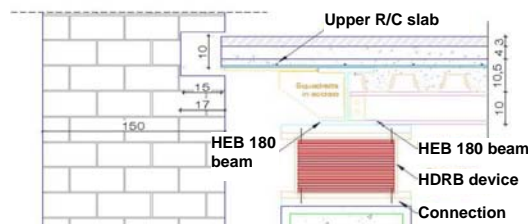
Transversal section of the ground floor in correspondence with a HDRB
